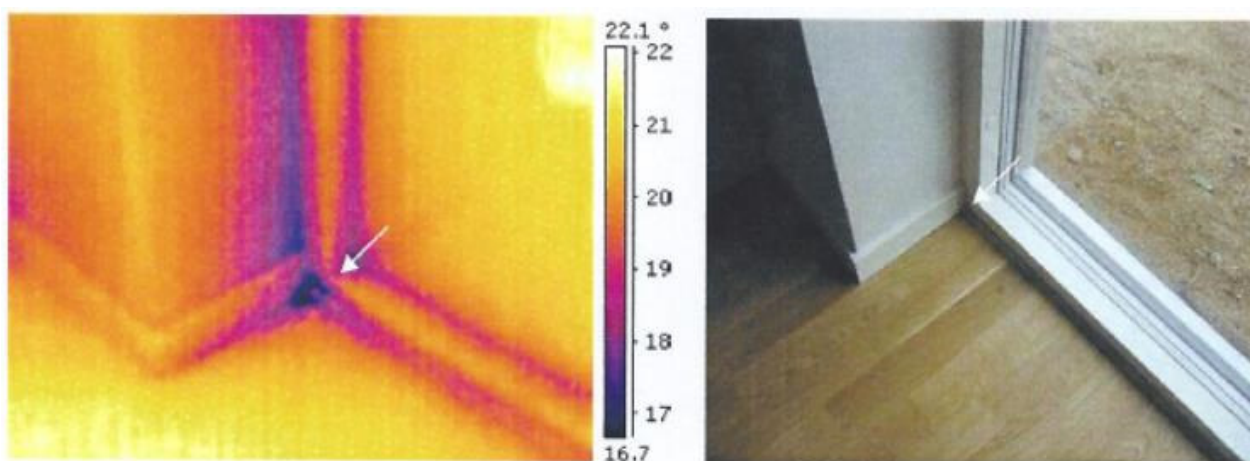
Small leakage between window and corner floor/wall, bottom floor.
